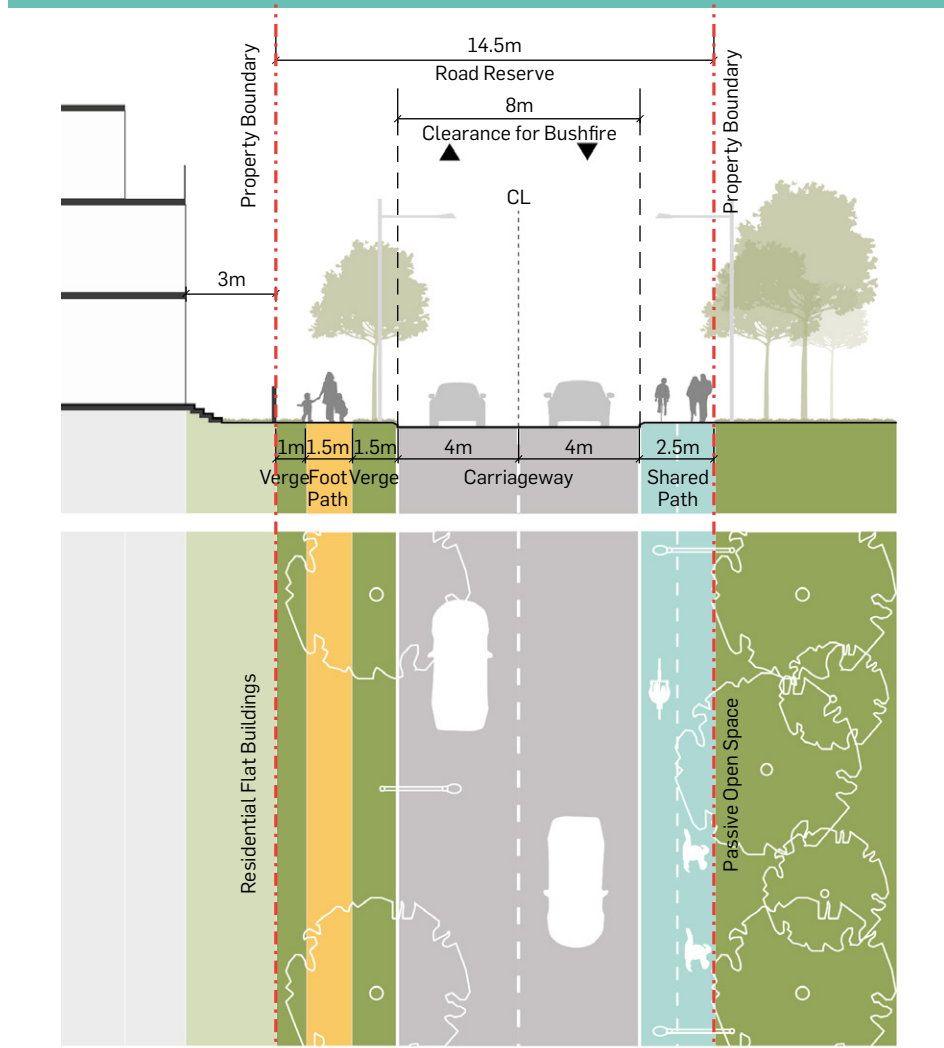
Indicative Street Section F-F' - Access Place - Bushfire Compliant
